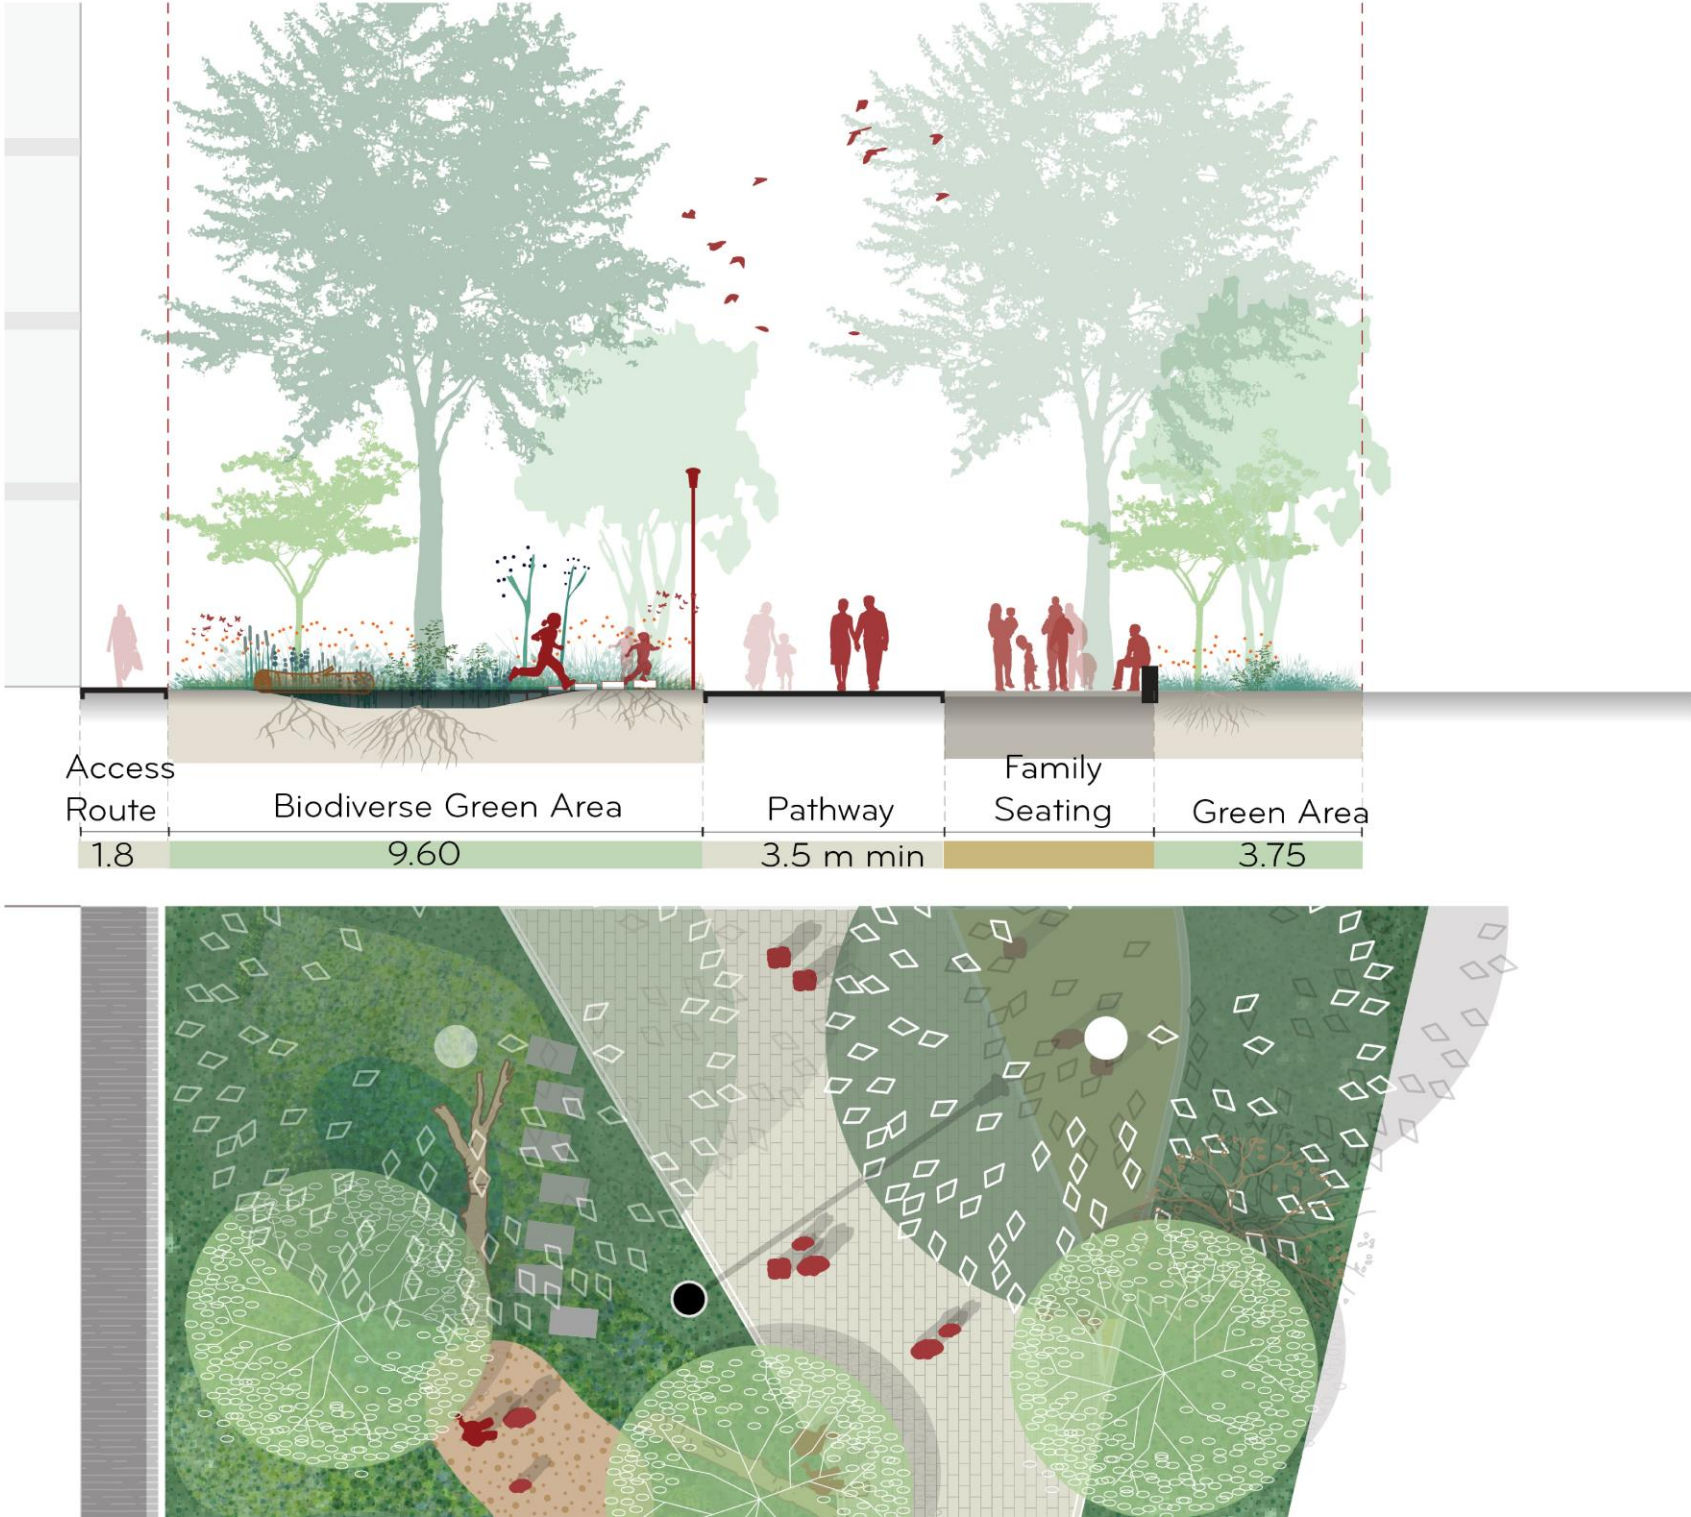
N8 Gateway & Biodiverse Pocket Park - Plan
